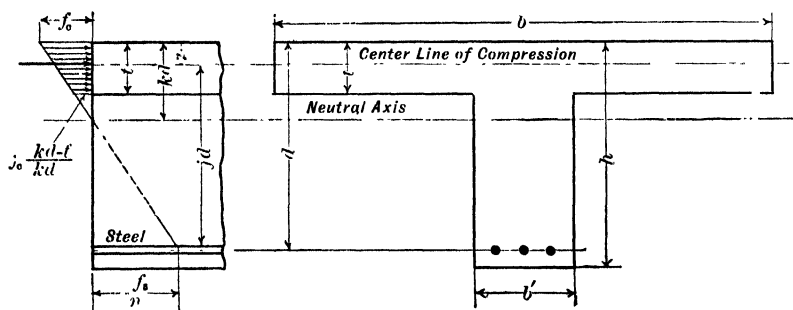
Resisting Forces in T-shaped Section of Beam. (See p. 356.)
